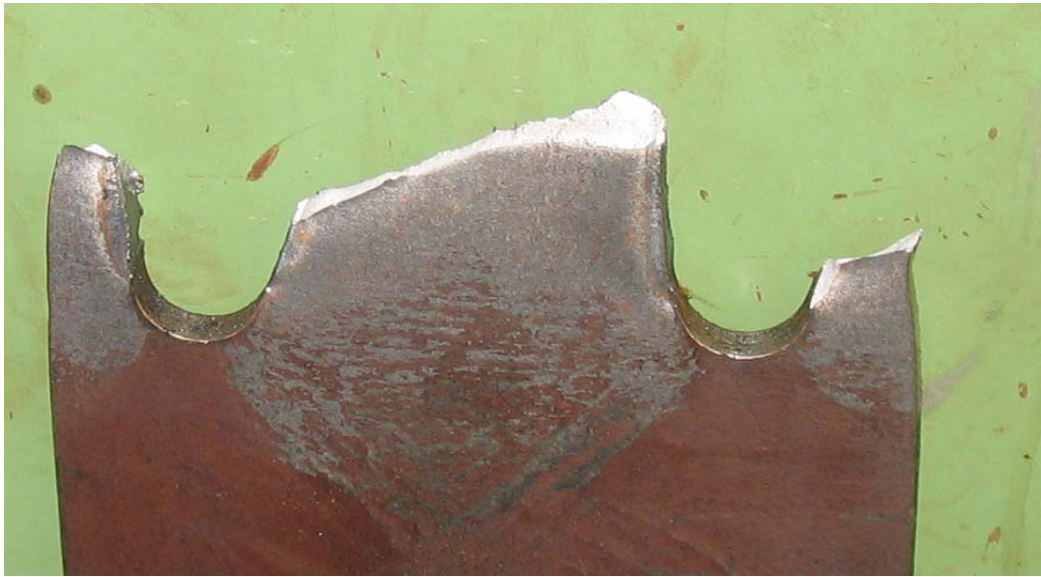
Failure of short slotted A36 3/4" specimen
